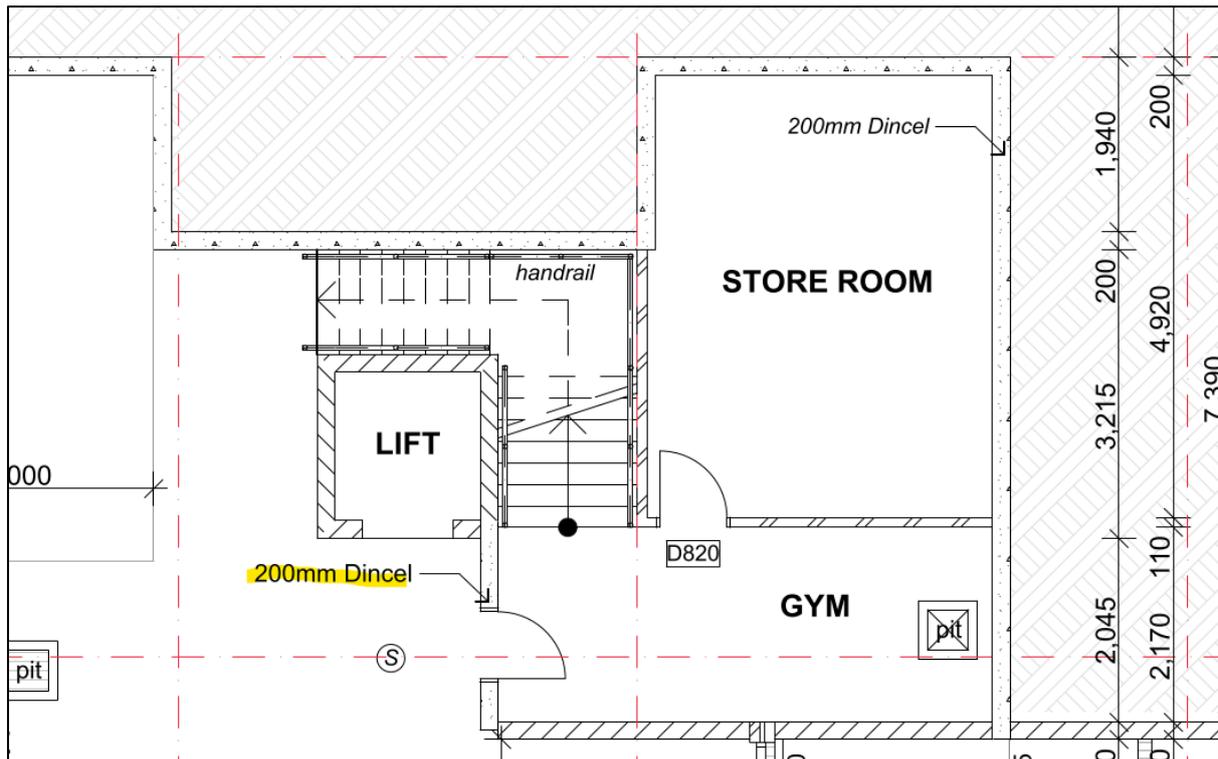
Extract of the CC stamped plans, dated 10/11/2020.
